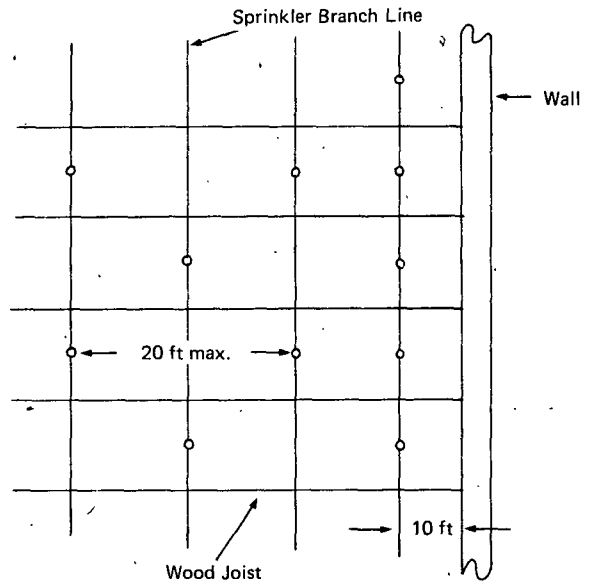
Sprinkler Location in Composite Wood Joist Construction
